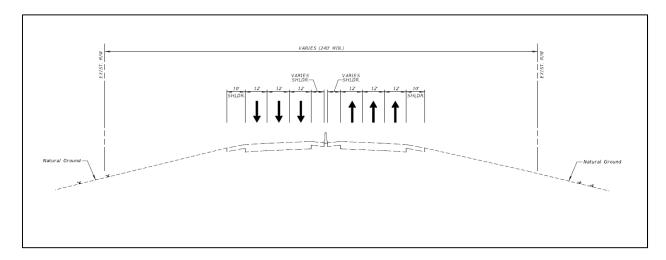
General Existing Roadway Typical Section – I-10 (SR 8)
